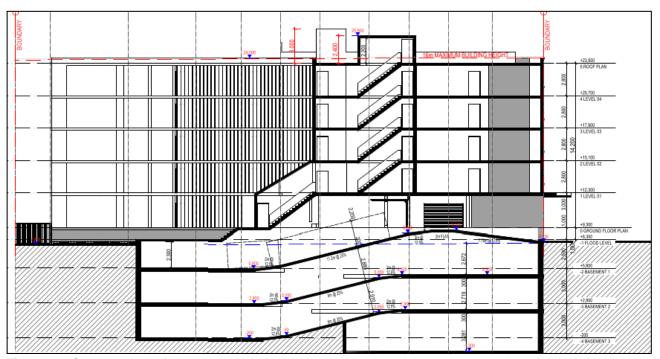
Section plan of the proposed development showing the areas exceeding the building height standard.
